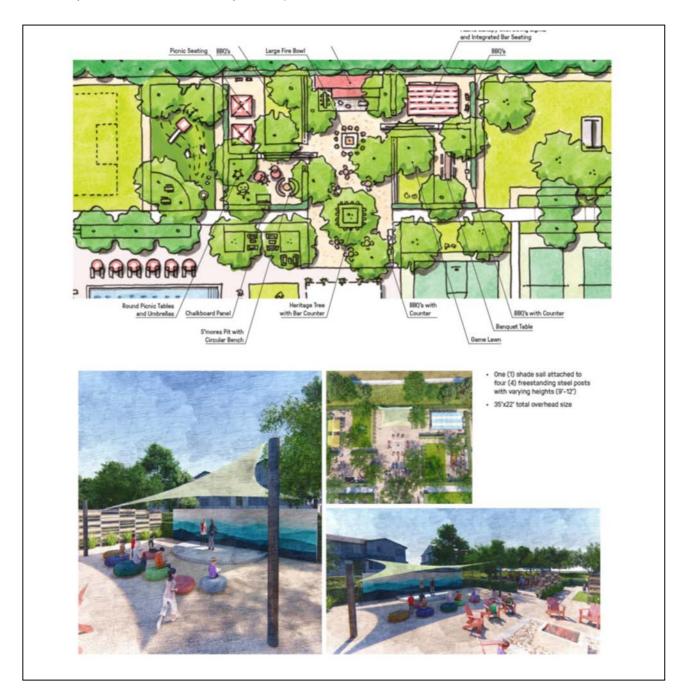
Backyard Gathering Area Conceptual Site Plan & Perspective
